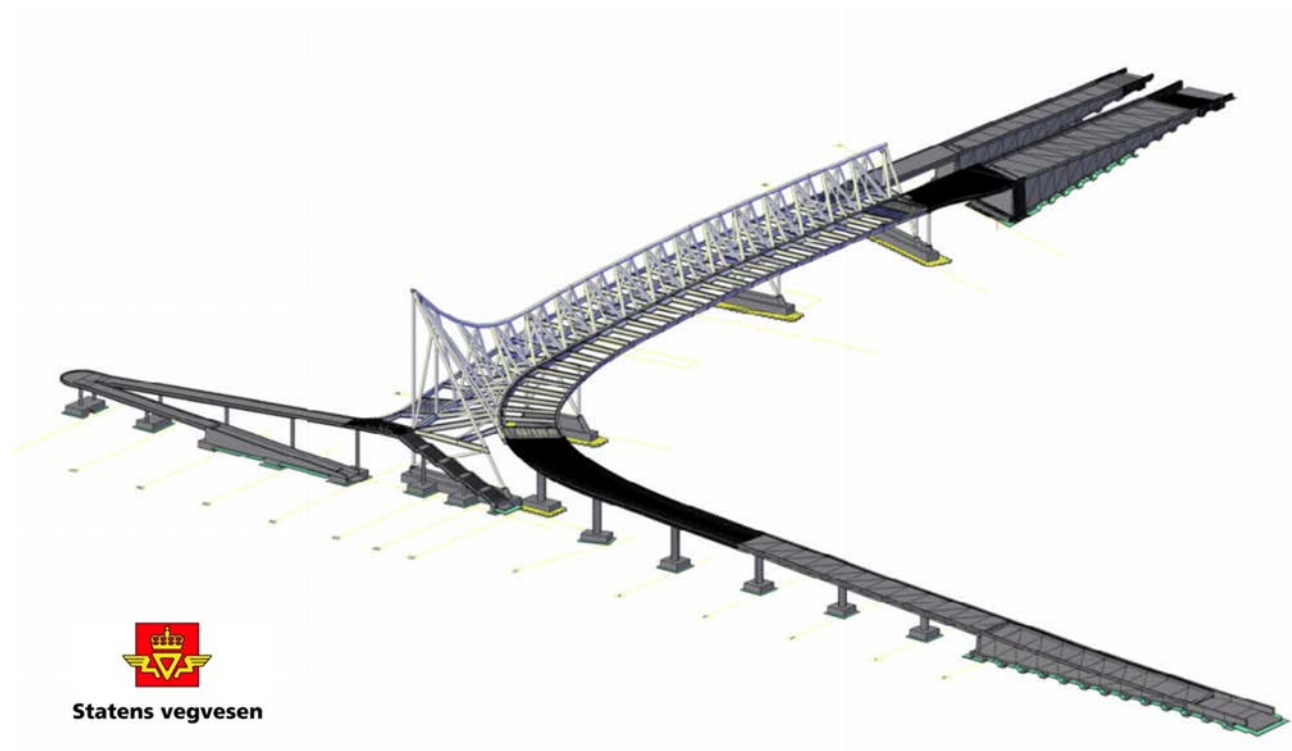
Use case steel bridge (source Statens vegvesen, MINnD)
